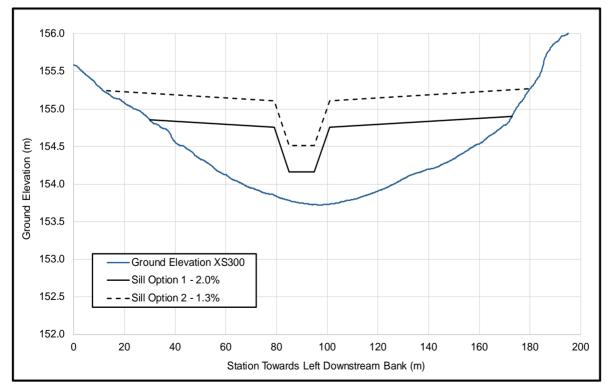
Typical Existing Channel Bed and Conceptual Sill Cross-Sections (Vertical Exaggeration 30:1)
